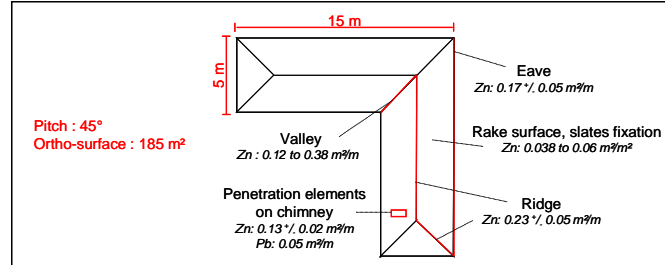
block plan of our example roof and metallic surface areas for the case of slate roofing
